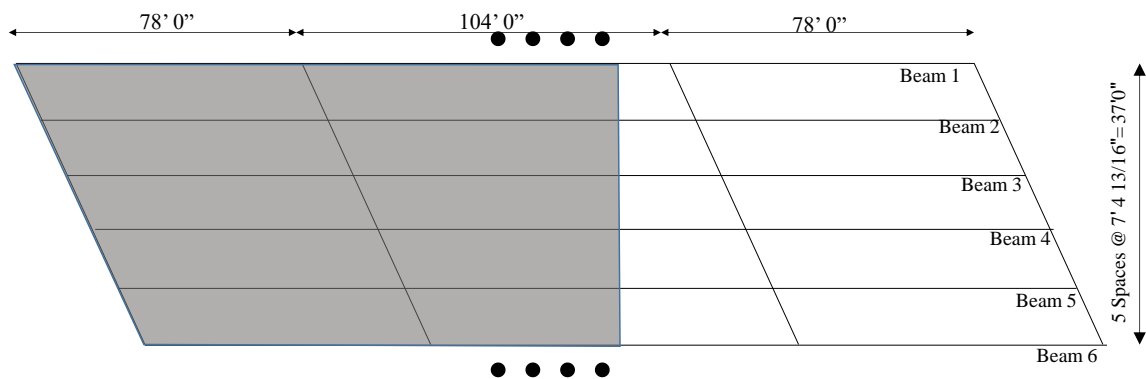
260 ft Standard Bridge Span 2 vehicle and wet concrete load for skewed bridges
